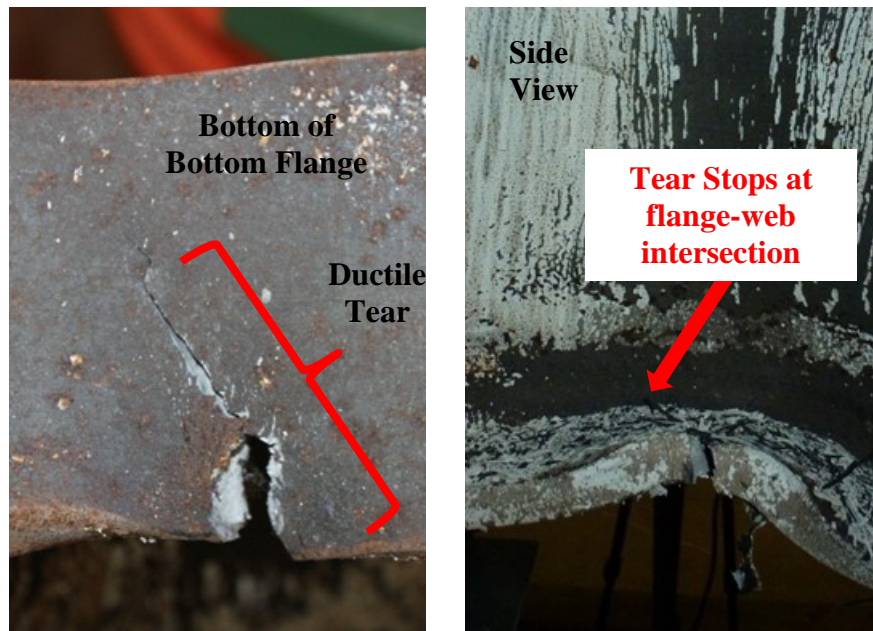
Bottom Flange Ductile Tear in Specimen 1 (W24x62 with RBS but No Fasteners)
